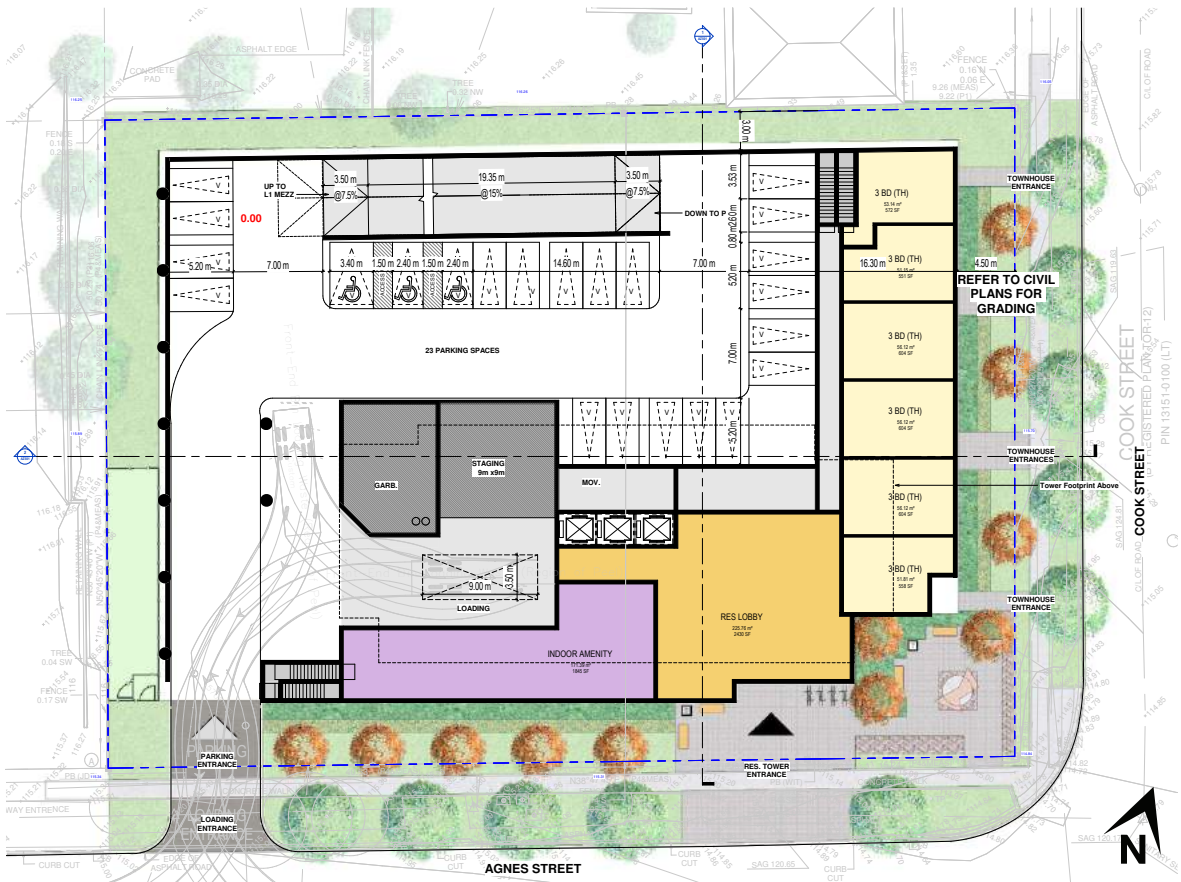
Ground Floor Plan (Prepared by Sweeney & Co.)
